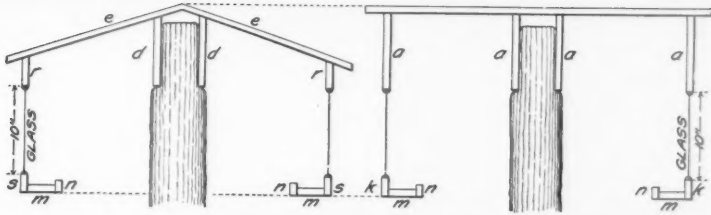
CROSS AND LONGITUDINAL SECTIONS OF FOOD HOUSE SHOWN IN FIGURE 5.
